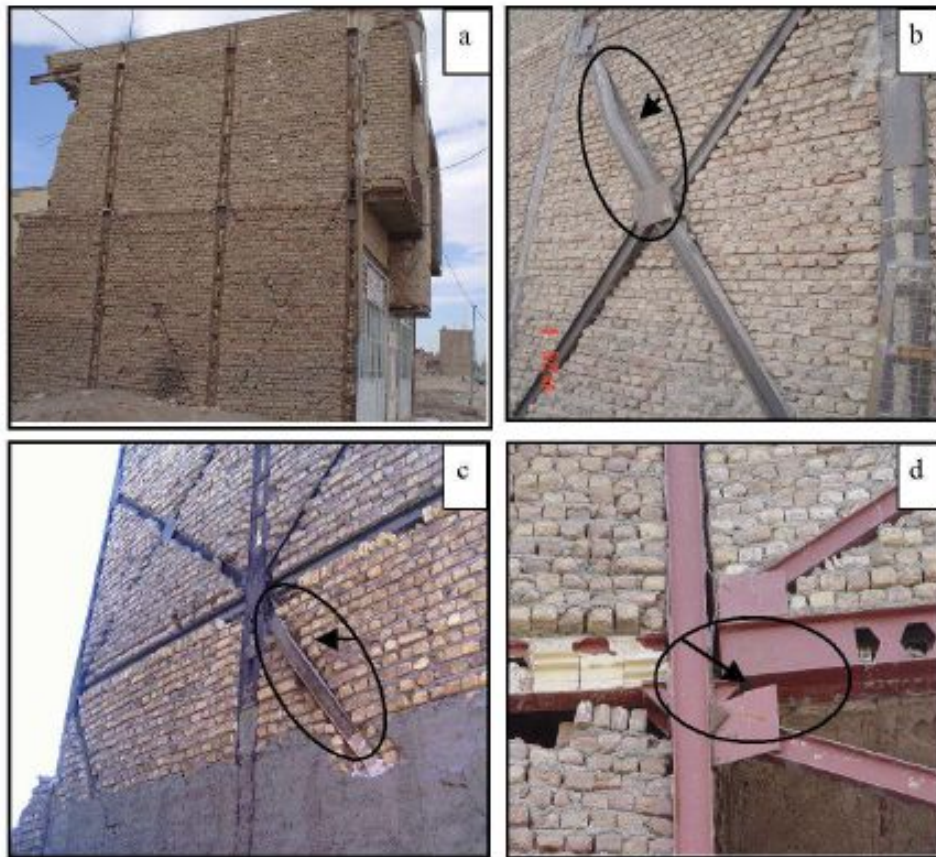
(a) A typical CBF with masonry infill in Bam, Iran; (b, c) Buckling of X braces and (d) Fracture of horizontal re-entrant corner of gusset plate weld line and spalling of masonry infill in the 2003 Bam earthquake
